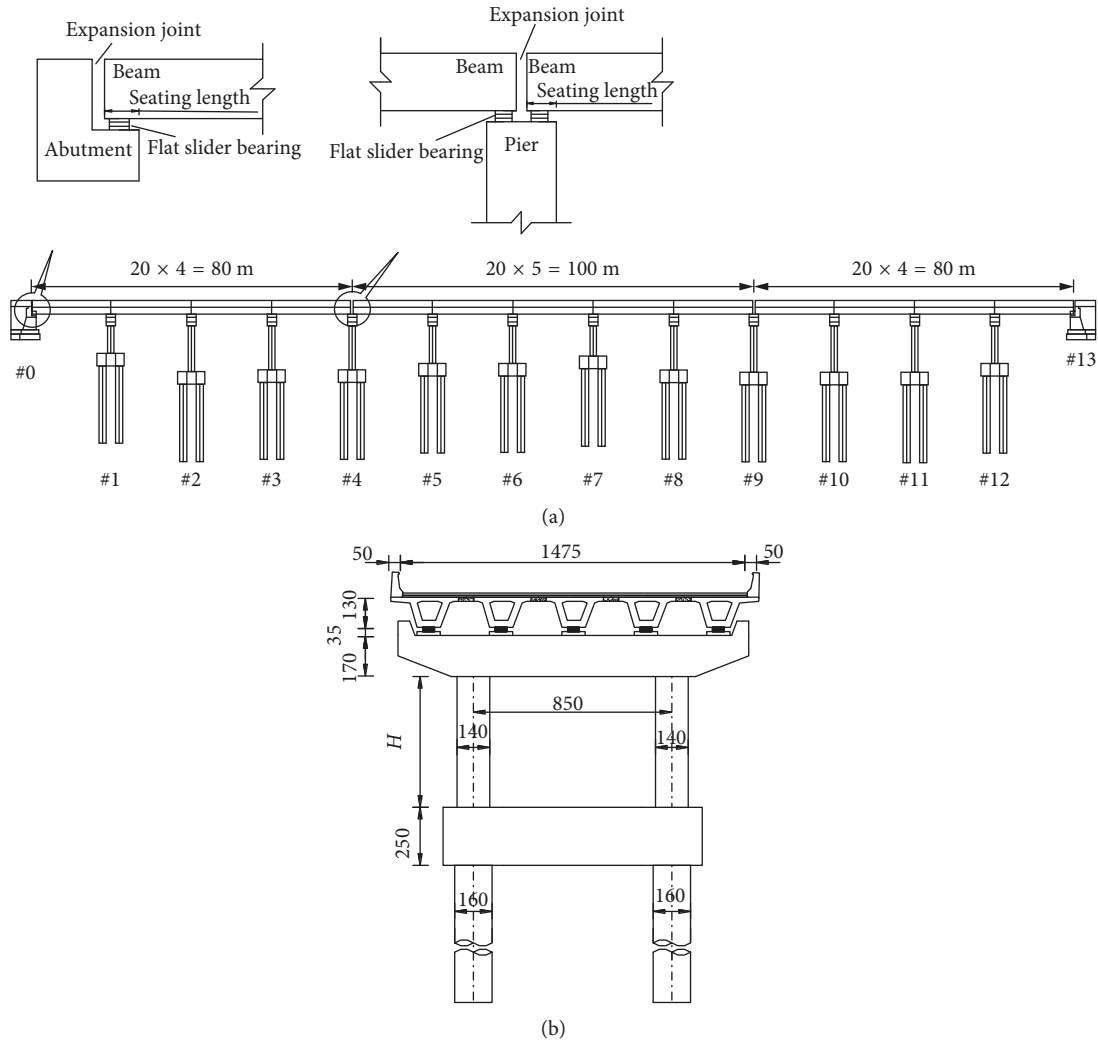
Elevation and transverse section of the bridges. (a) Elevation (unit: cm). (b) Transverse section (unit: cm).
